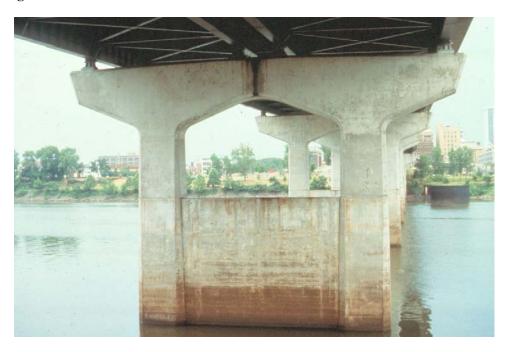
Two Column Bent Joined by a Web Wall
